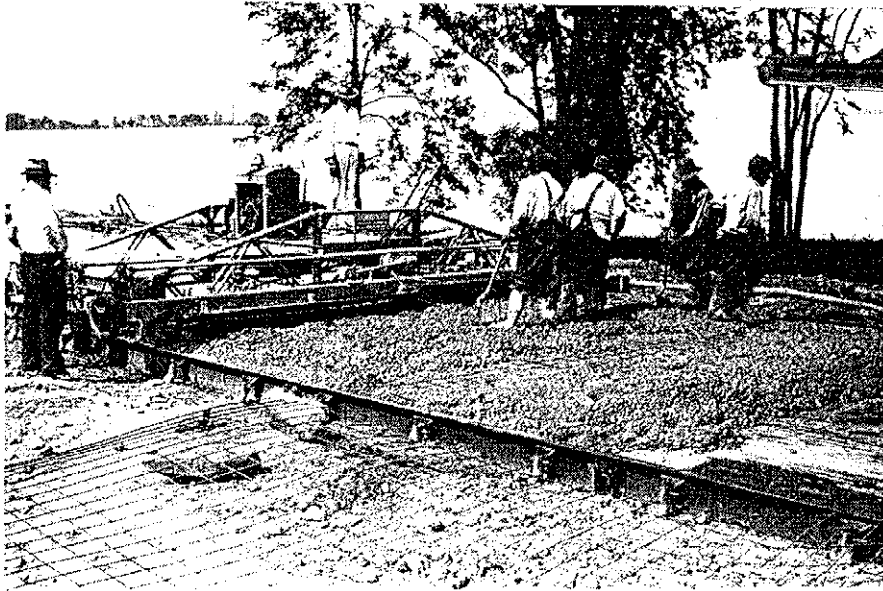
Laying reinforced concrete pavement near Wellington, July 1931 (Mount Vernon Memorial Highway File #31-1246, RG-30-N, NARA)
